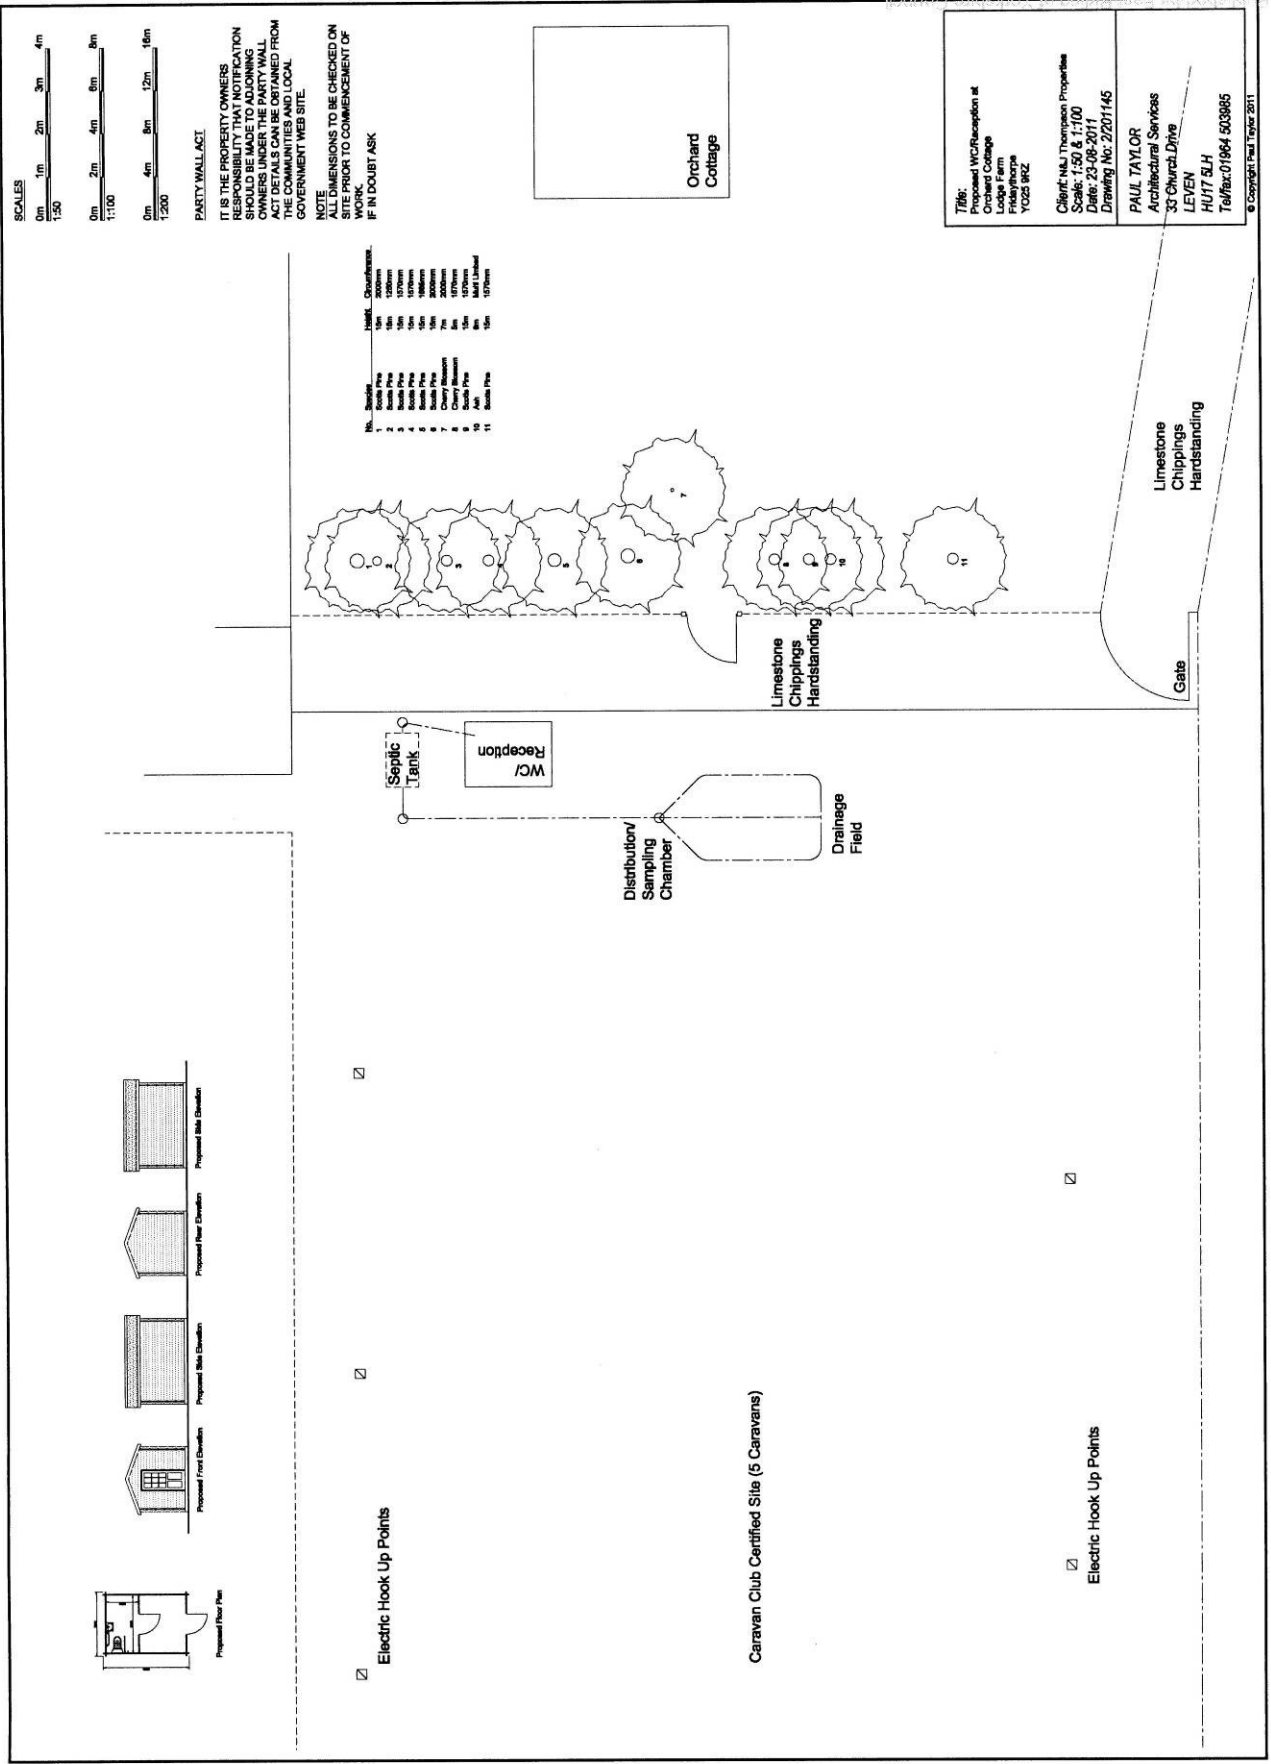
DEVELOPMENT PROPOSALS (not to scale - plan supplied by Paul Taylor Architectural Services)
